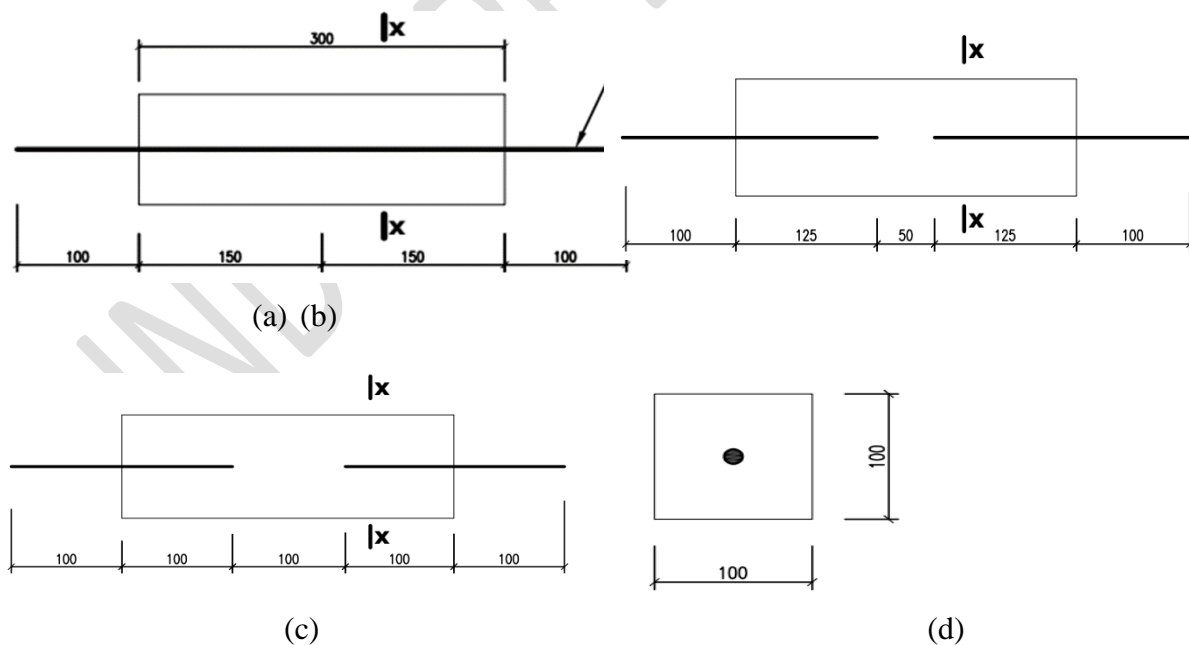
Illustration of concrete prism specimens for double pull-out test:(a) with 150mm rebar embedment (b) with 125mm rebar embedment, (c) with 100mm rebar embedment, (d) section x-x
